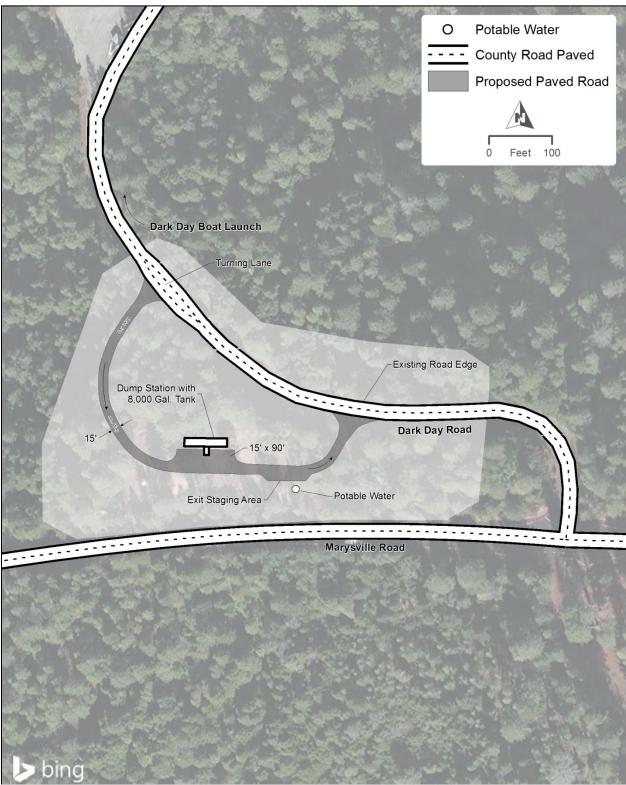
Conceptual layout for Dark Day RV Dump Station.
